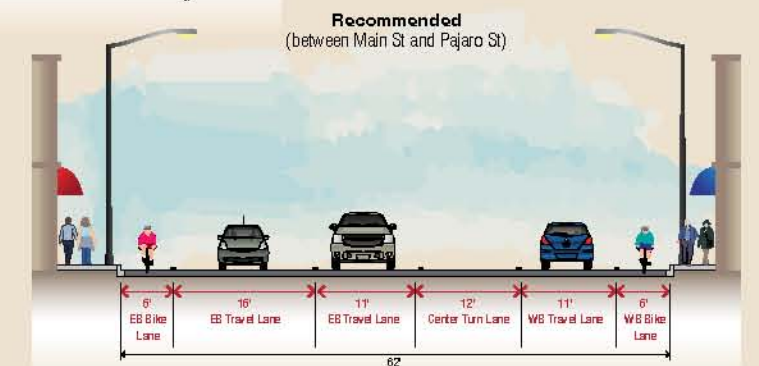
RECOMMENDED IMPROVEMENTS ALISAL STREET BETWEEN CAYUGA STREET AND PAJARO STREET
